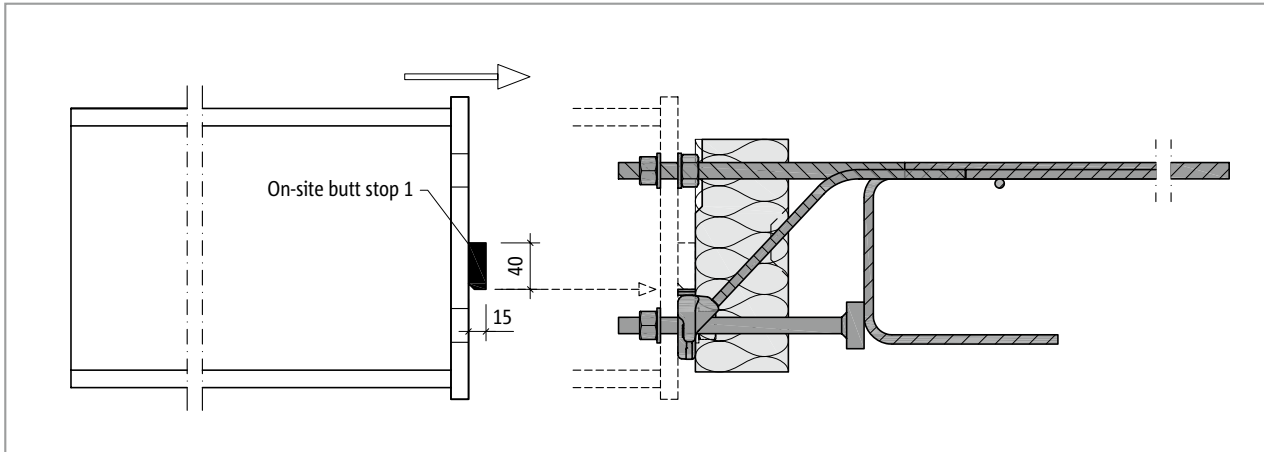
Schöck Isokorb® T type SK: Mounting the steel member
